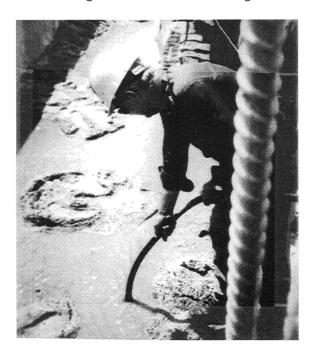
Flooding and Vibration of First Lift of Granular Backfill, North Abutment, Bridge C
